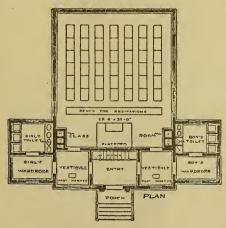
Floor Plan of Model One-room Schoolhouse.
